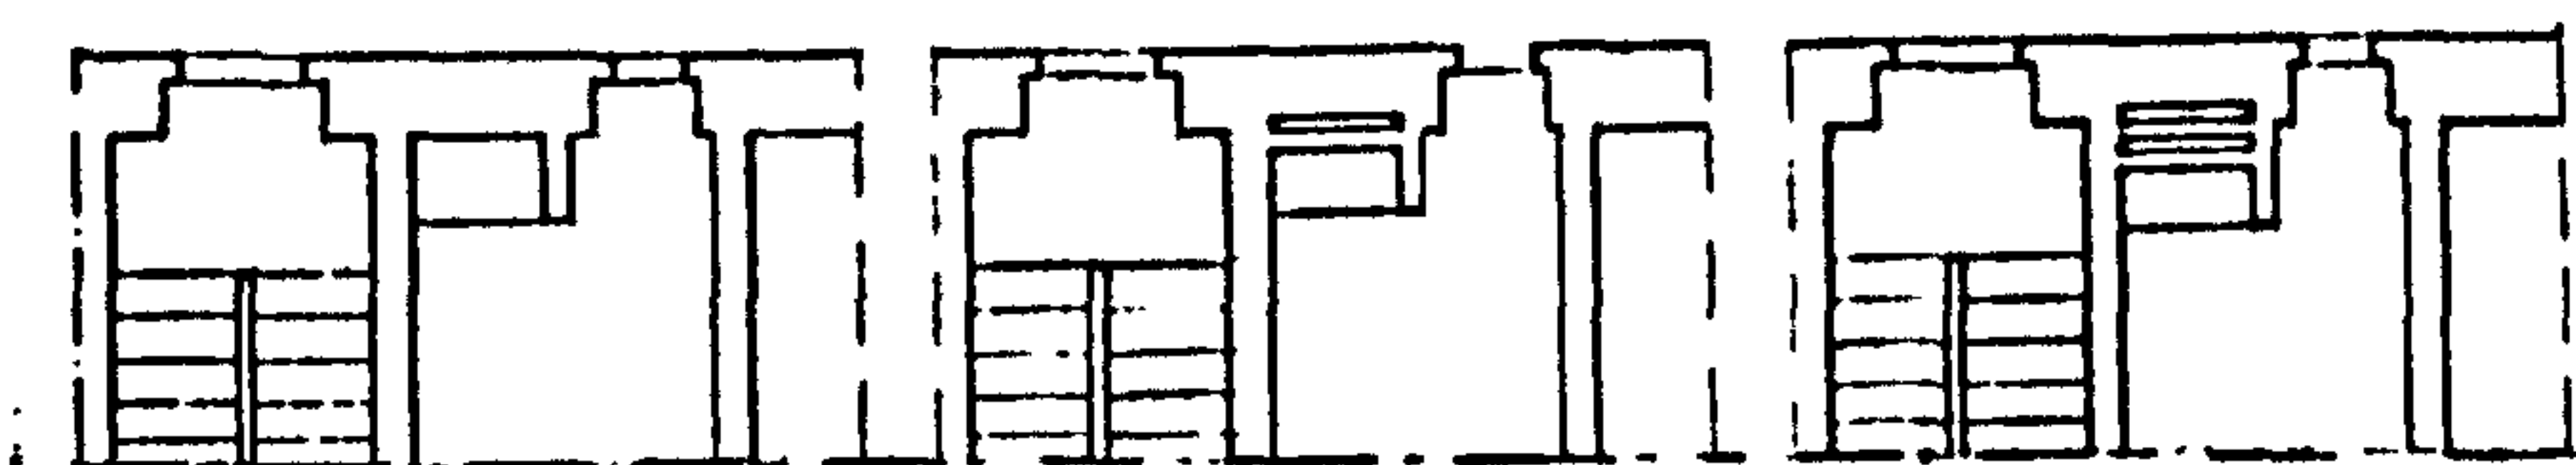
Plans of different floors, 118, Sapateiros Street
